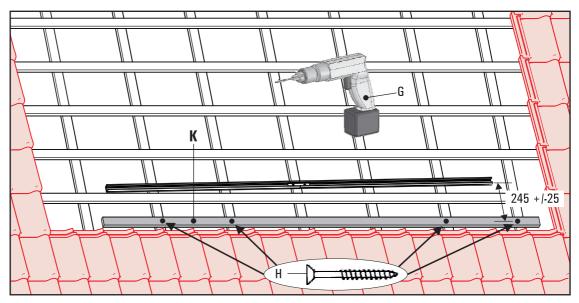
Fix lower auxiliary batten (K) with particle board screws (H) in the specified distance to the mounting rails.
